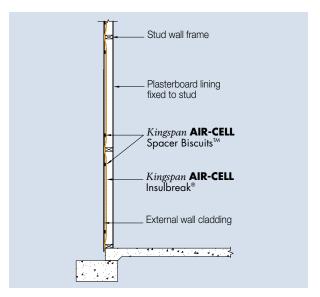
Side elevation of Kingspan AIR-CELL Insulbreak® on steel-framed wall
